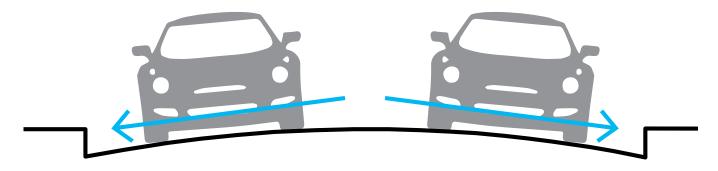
Sectional representation of the crown of a road. This shows how two drainage areas are formed for a single street segment.
